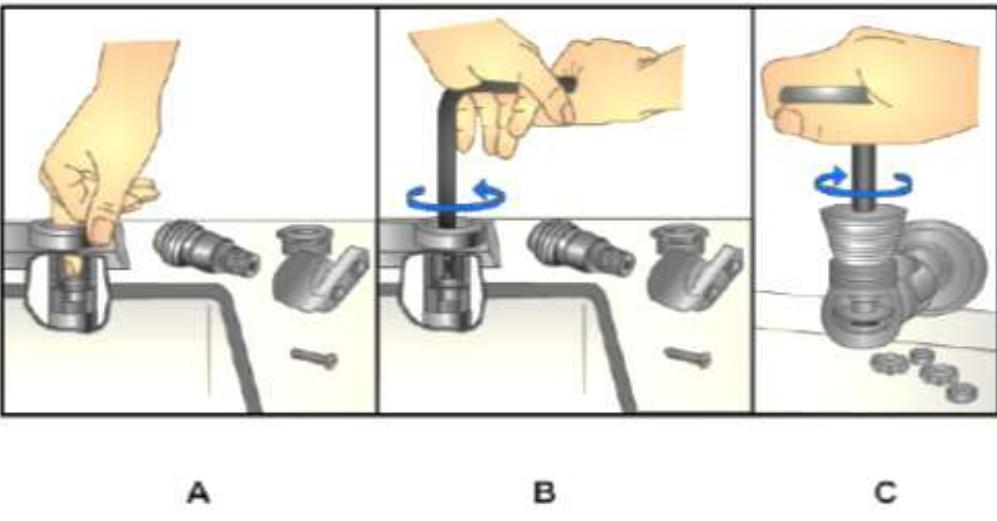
A: Inspecting, B:Removing, C:Refacing Faucets seats
